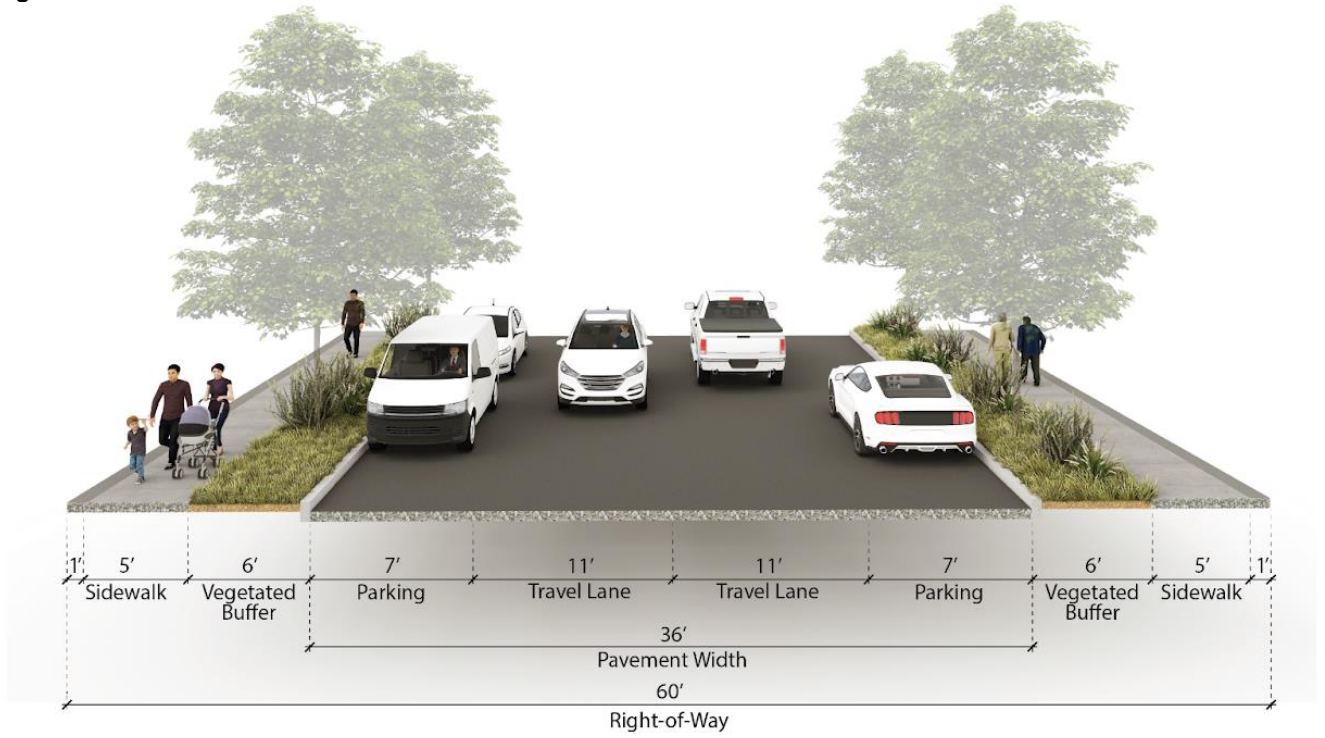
Cross-section for Urban Local Street – Minor Residential Street
